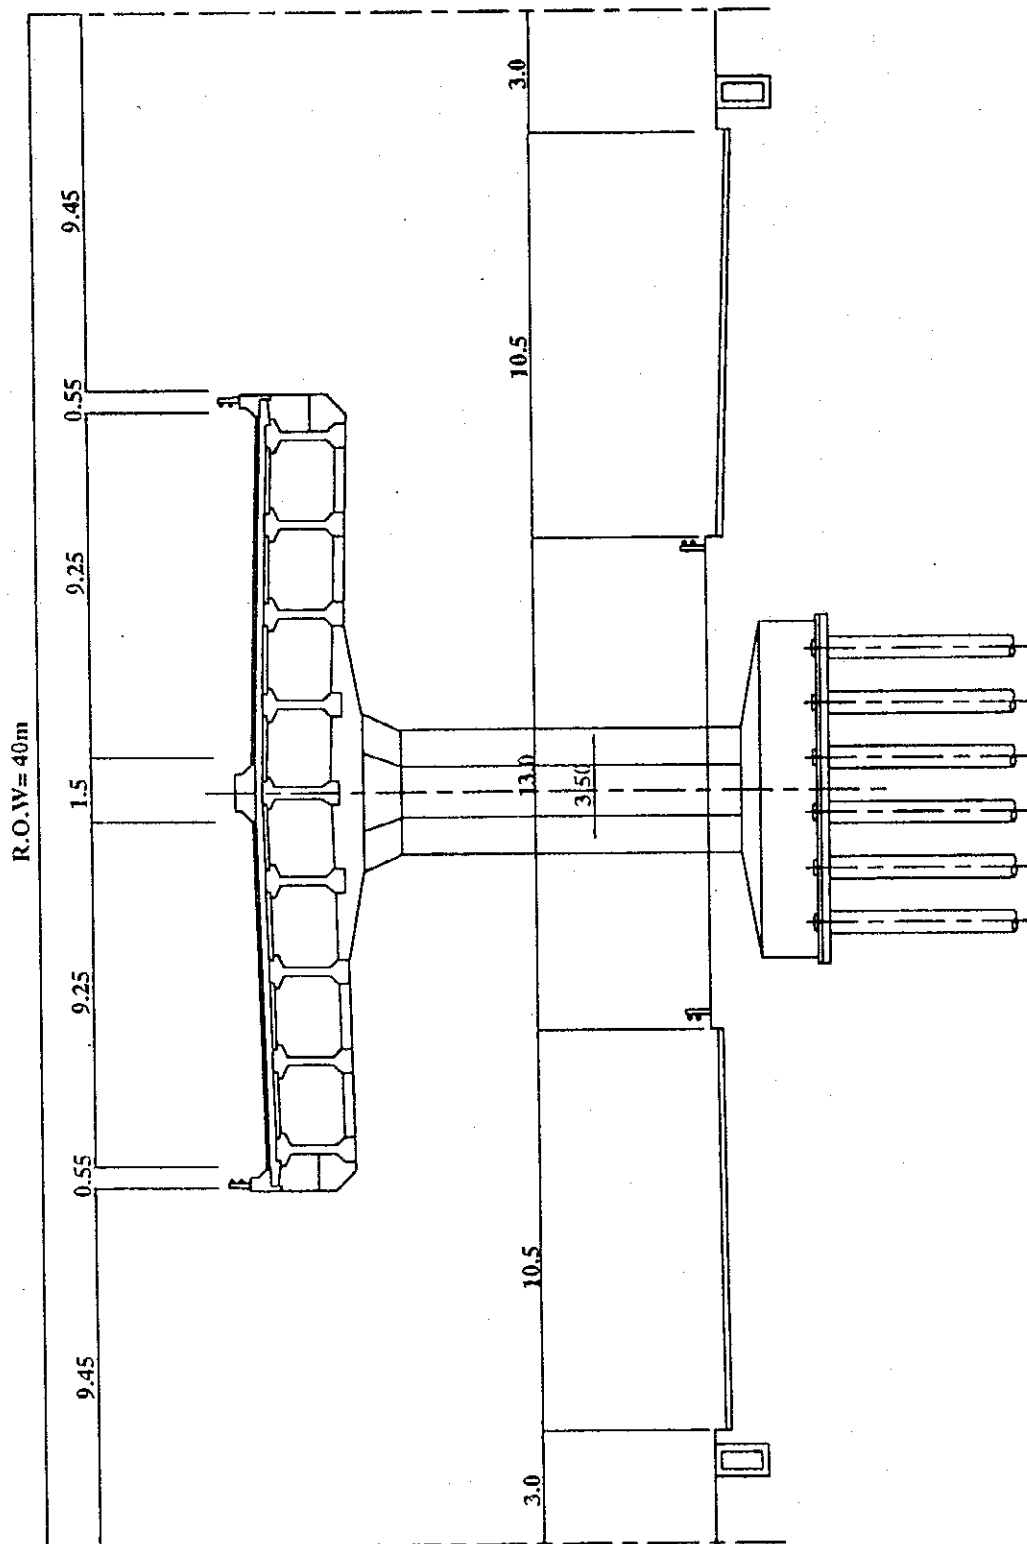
Typical Cross Section for the East - West Axis
